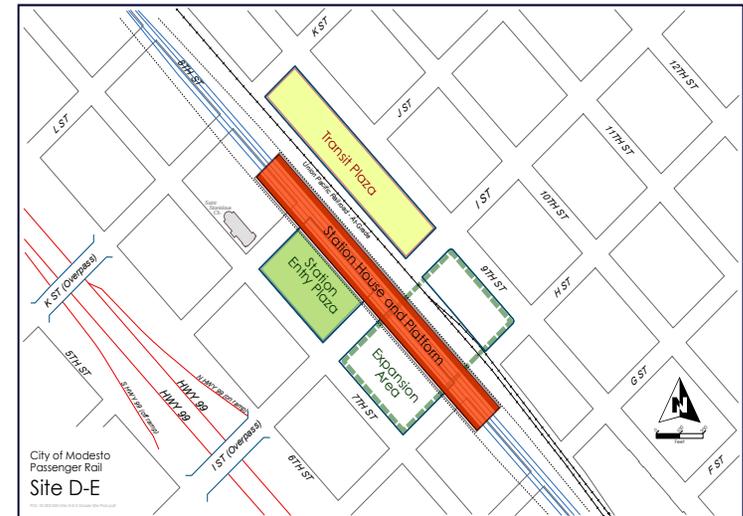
Conceptual Site Plan, At-Grade Passenger Rail Service
